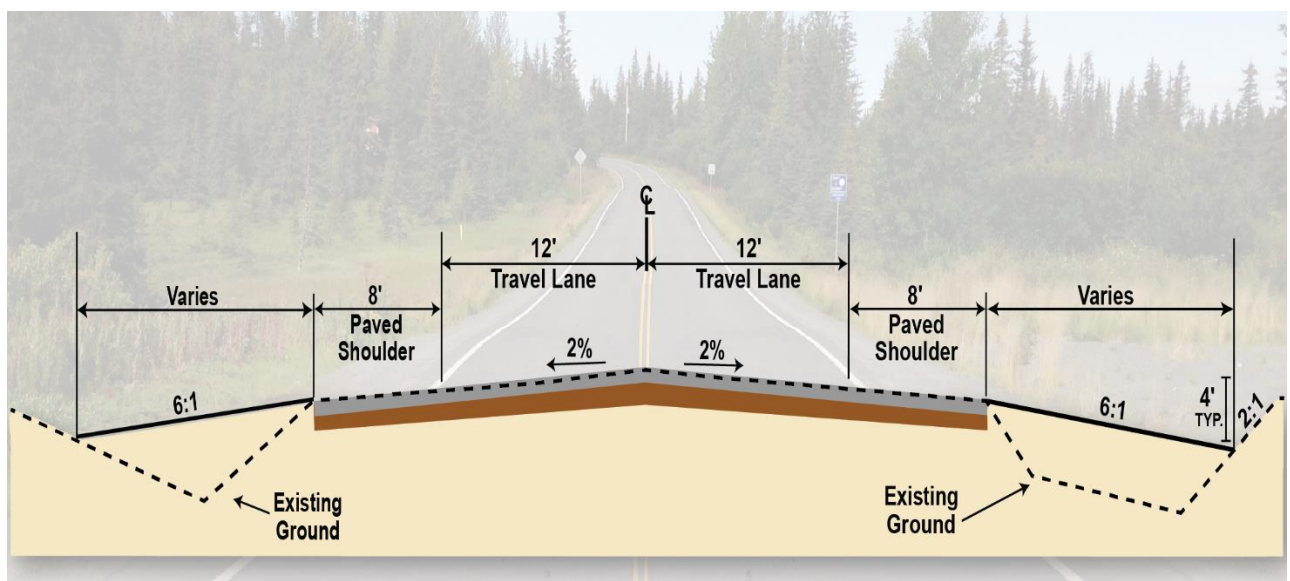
Standard road cross-section showing key elements of the road (Source: AASHTO, 2011)
